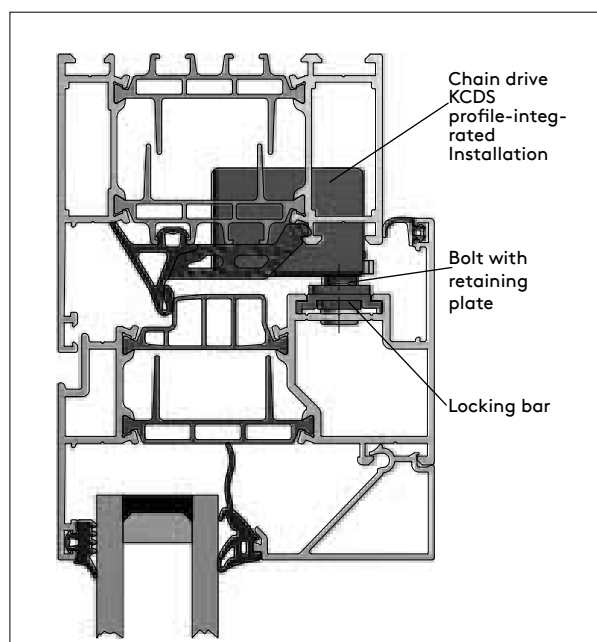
Example of assembly drawing for a Raico Frame bottom-hung window profile
